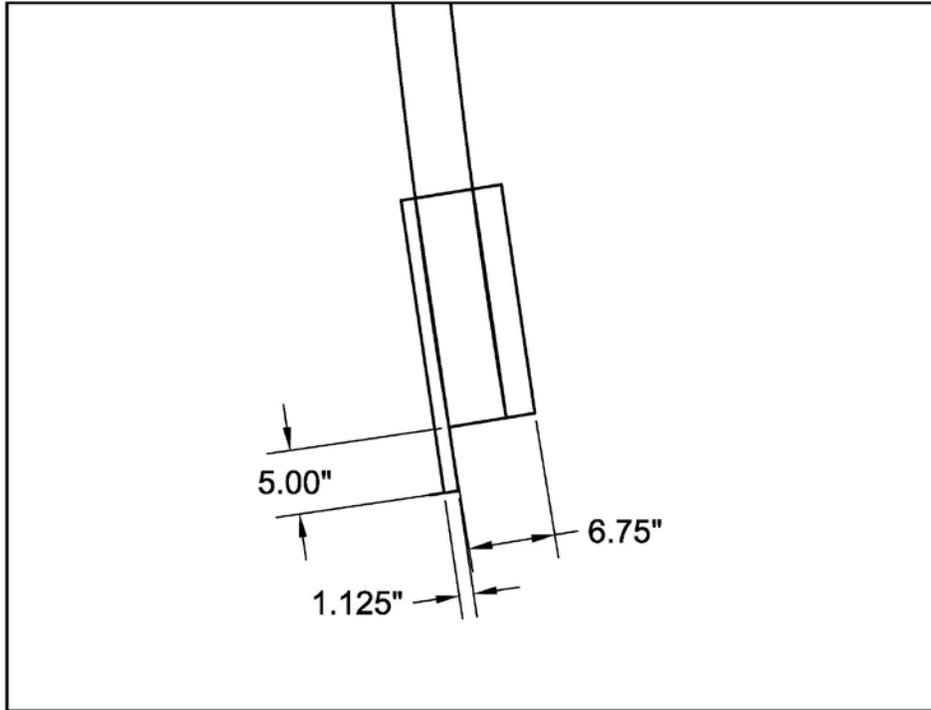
Modifications to gate lip to match bottom seal detail in drawing 485-D-2232 (dimensions are in prototype inches).
